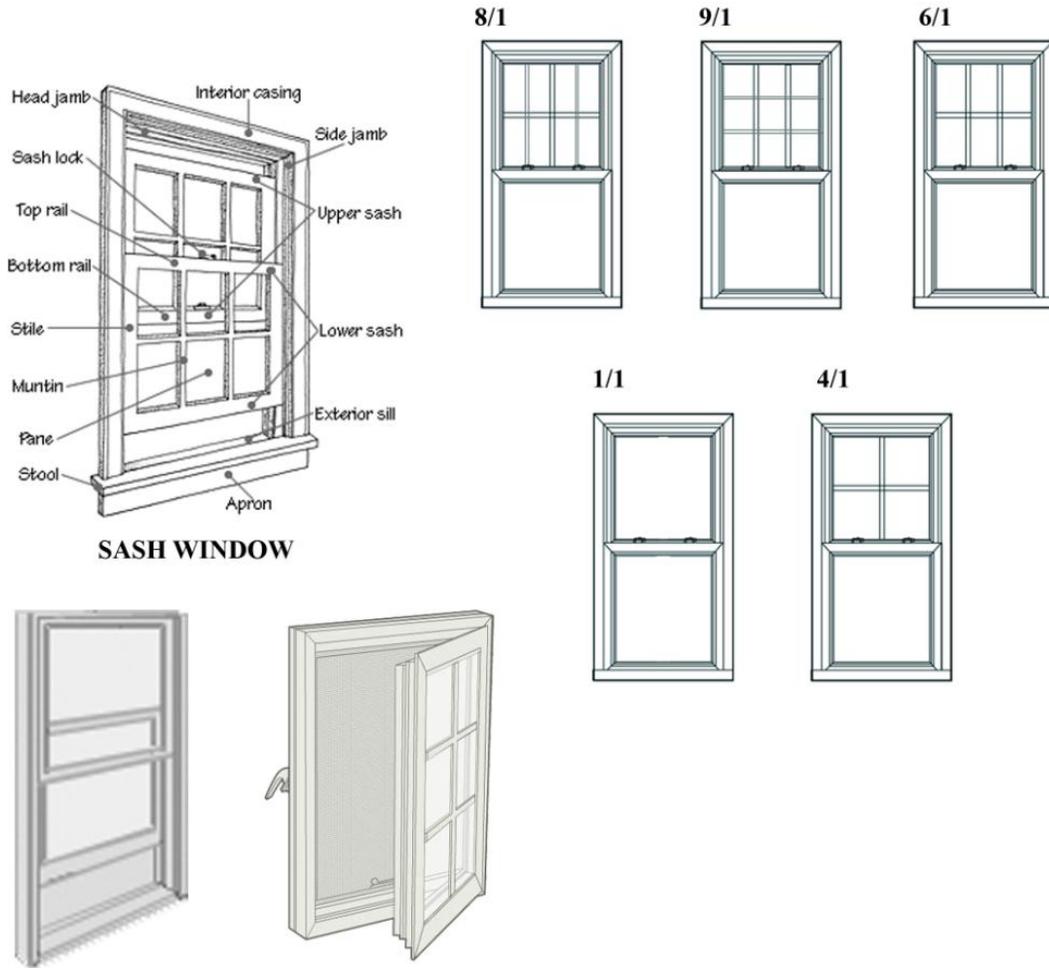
(Referenced in ~~1.1.3.3(C)~~ 110-320(c)(3)c. Design Detail: ~~Windows~~)
